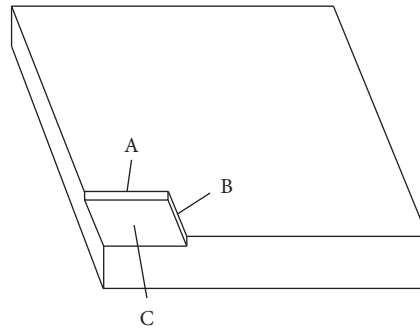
Schematic diagram of repairing corner of airport pavement.
